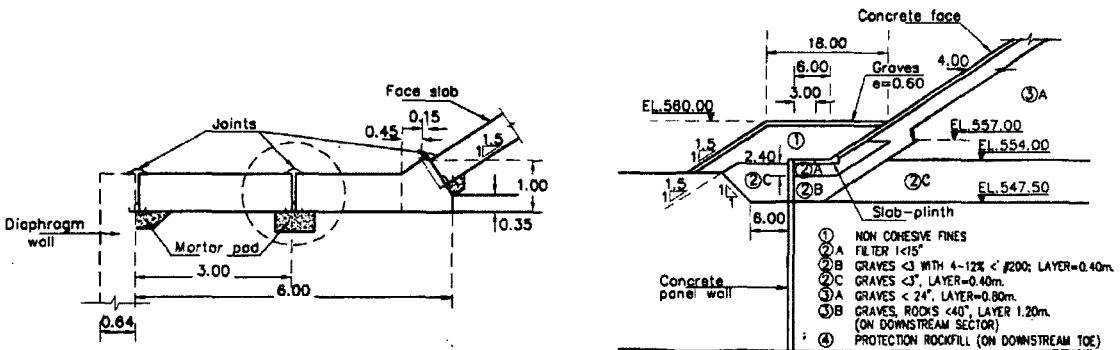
Plinth - foundation treatment in the Santa Juana dam.
